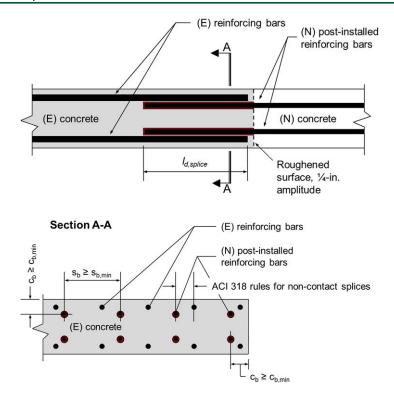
INSTALLATION PARAMATERS FOR POST-INSTALLED REINFORCING BARS
